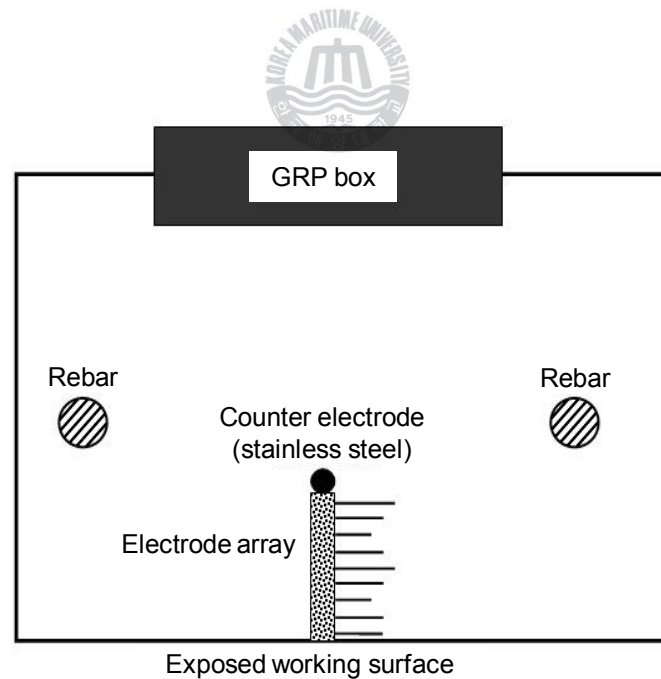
Sectional view of covercrete array into the concrete[73]
